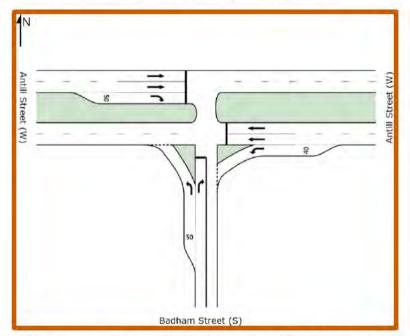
Recommended Layout for the Intersection of Antill Street and Badham Street
